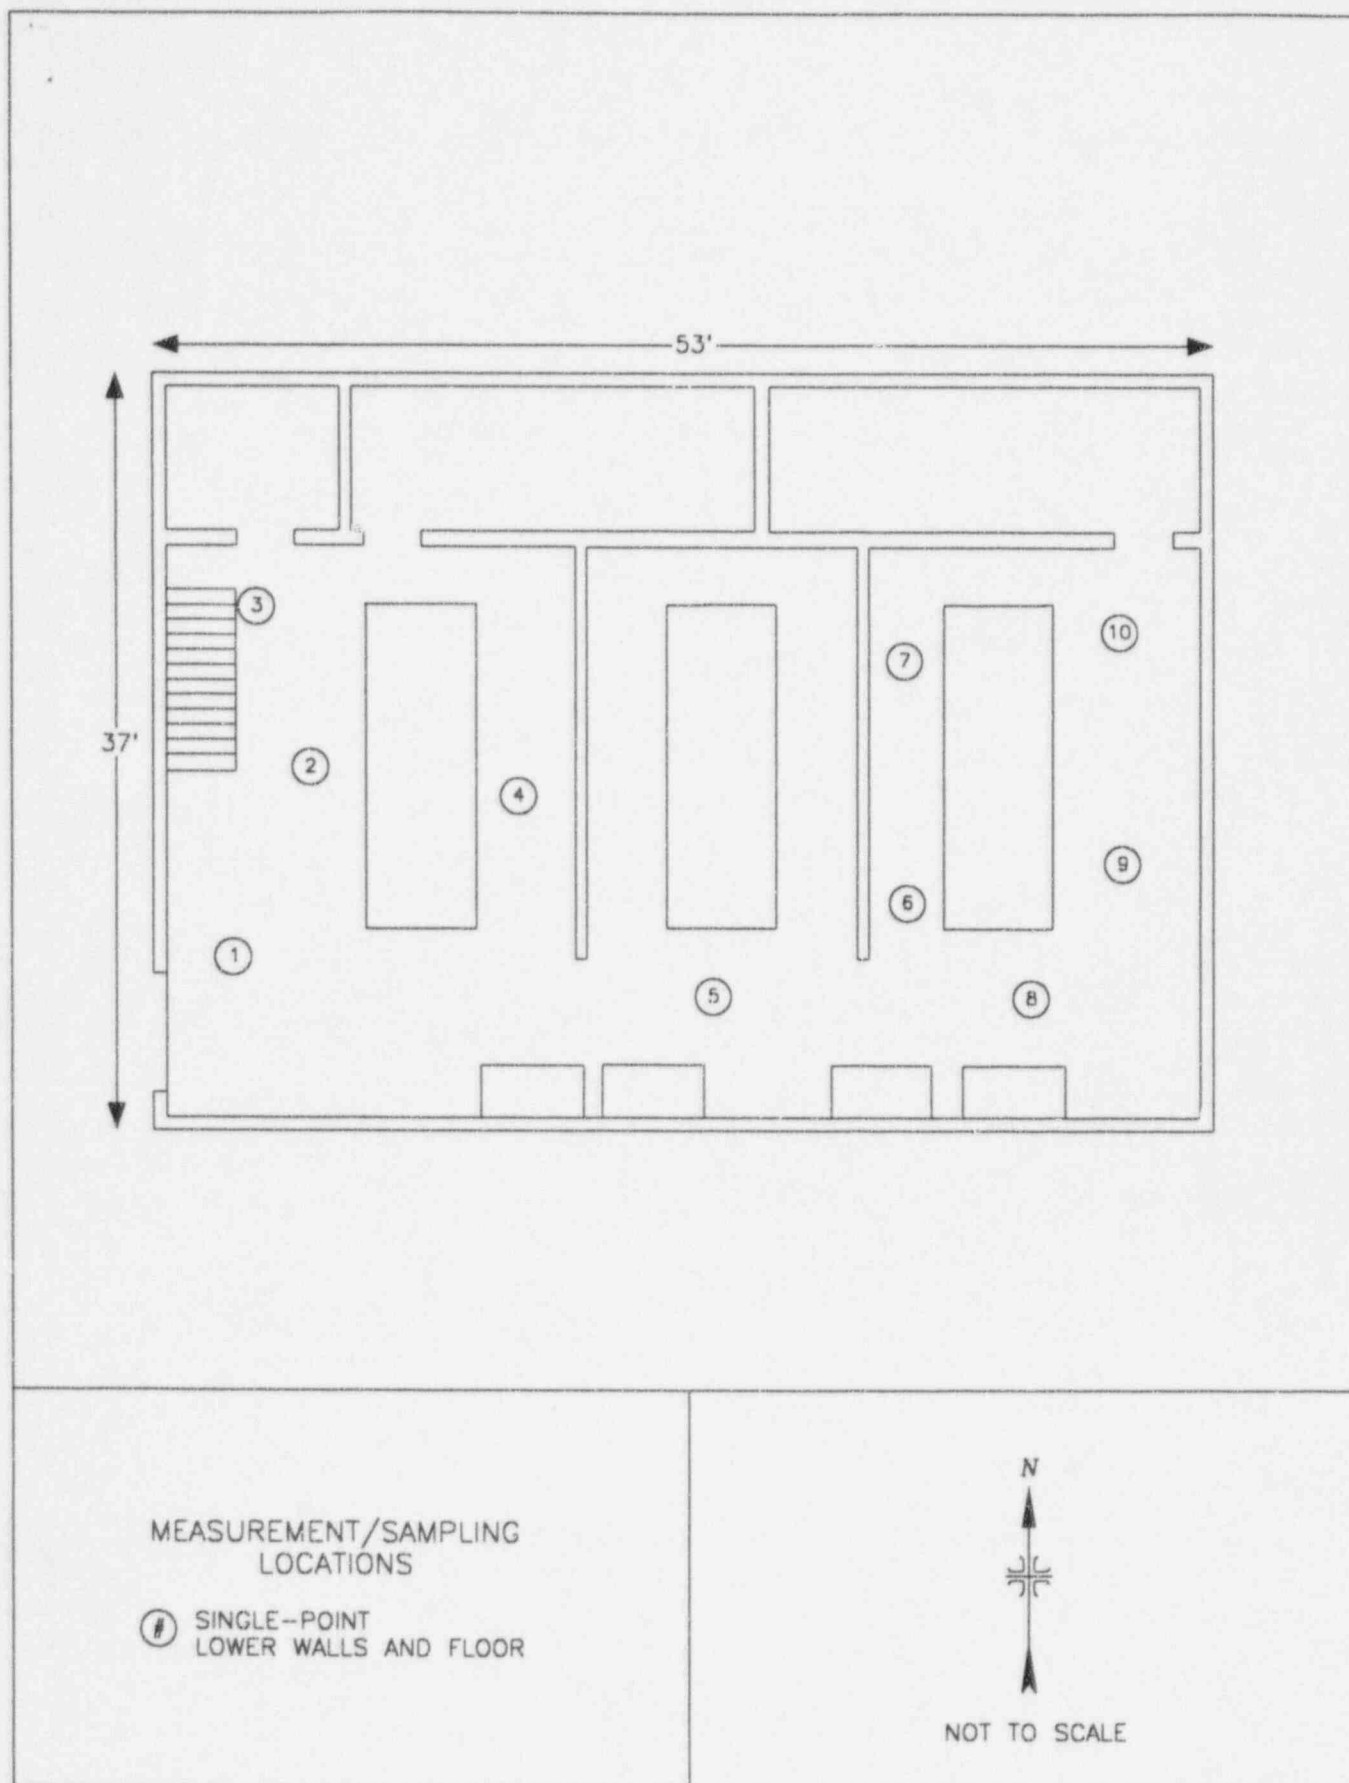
Fort St. Vrain Facility, Turbine Building, Level 5, Section C014 – Measurement and Sampling Locations
